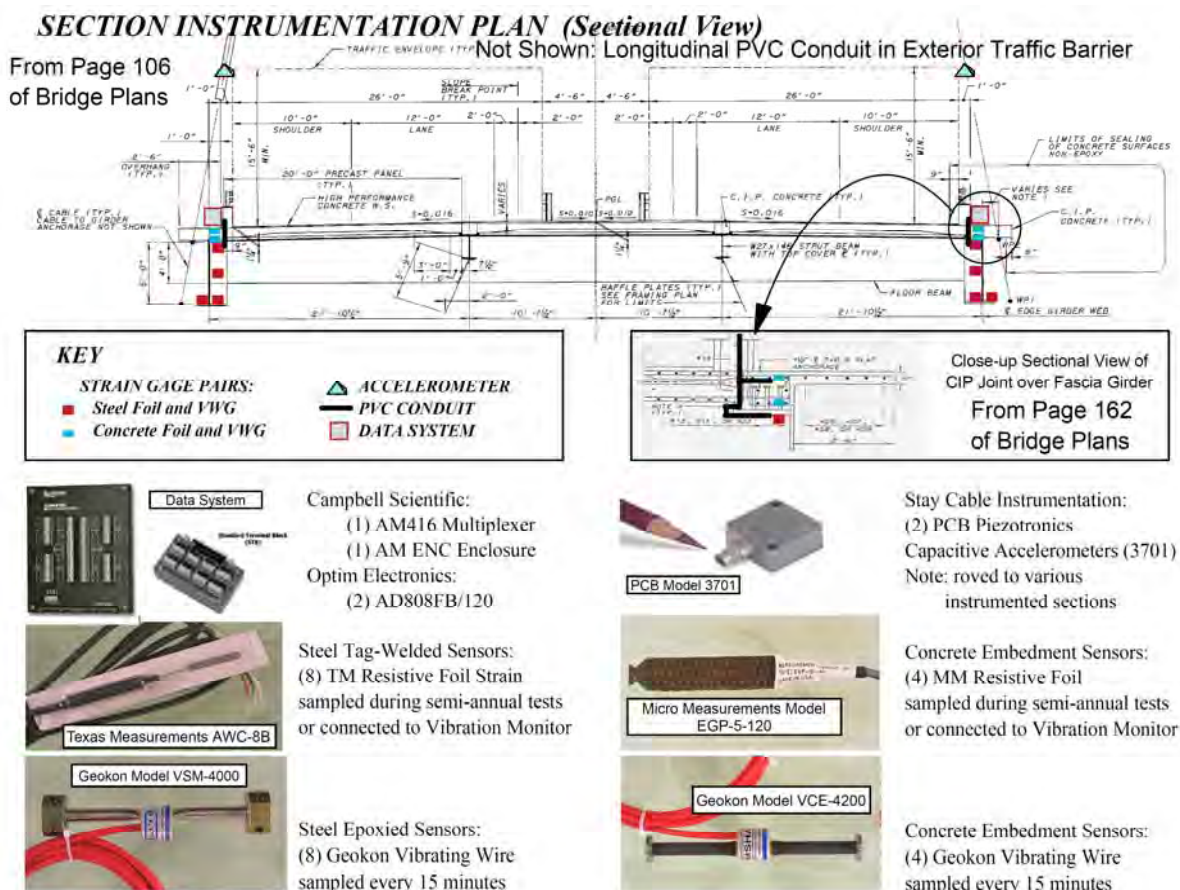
Sensor Plan for Selected Critical Sections of U.S. Grant Bridge (Hunt, 2005)
